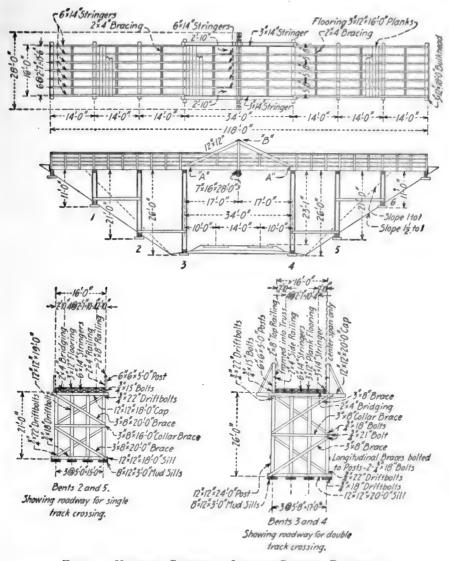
HIGHWAY CROSSING. ILLINOIS CENTRAL RAILROAD.
